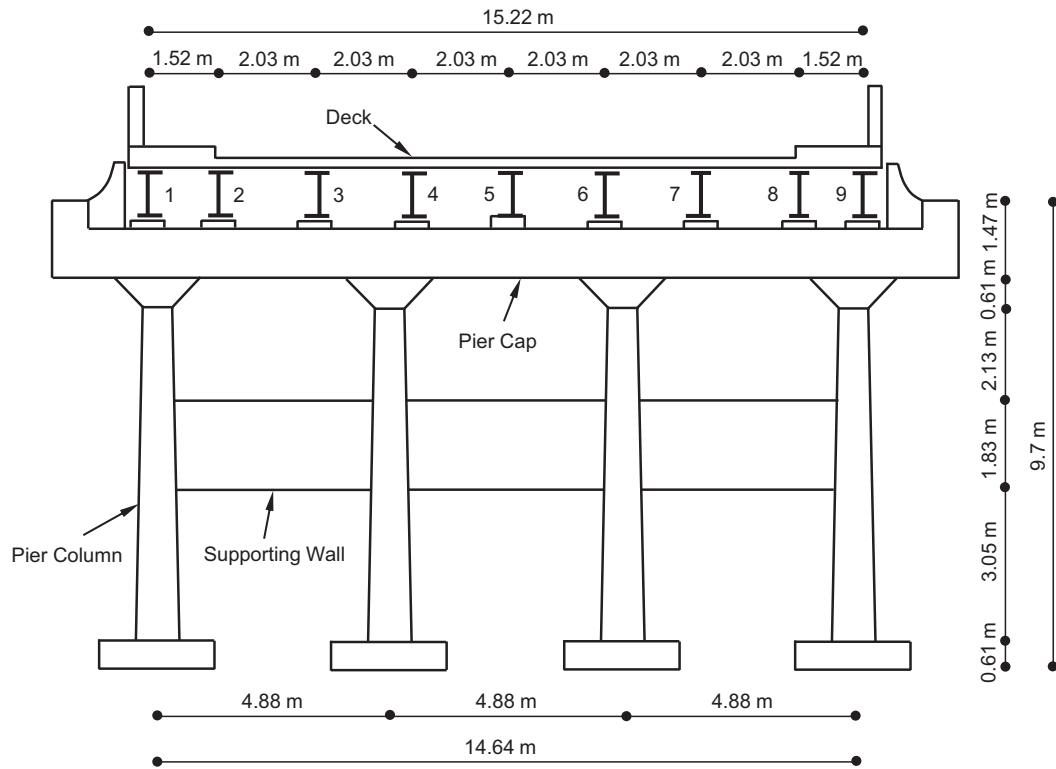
Cross-section of Colorado State Highway Bridge E-17-AH.
